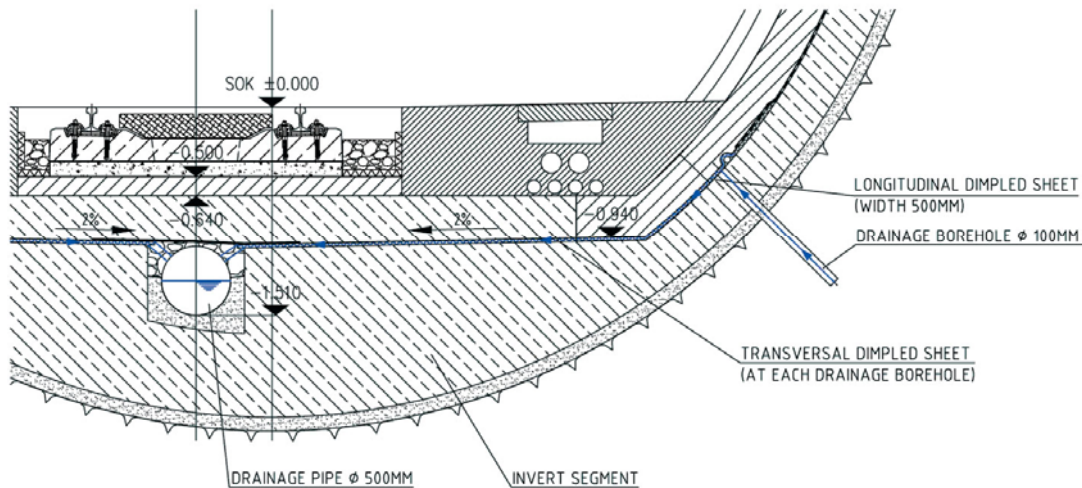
Cross section of the drainage system of the Koralm tunnel
